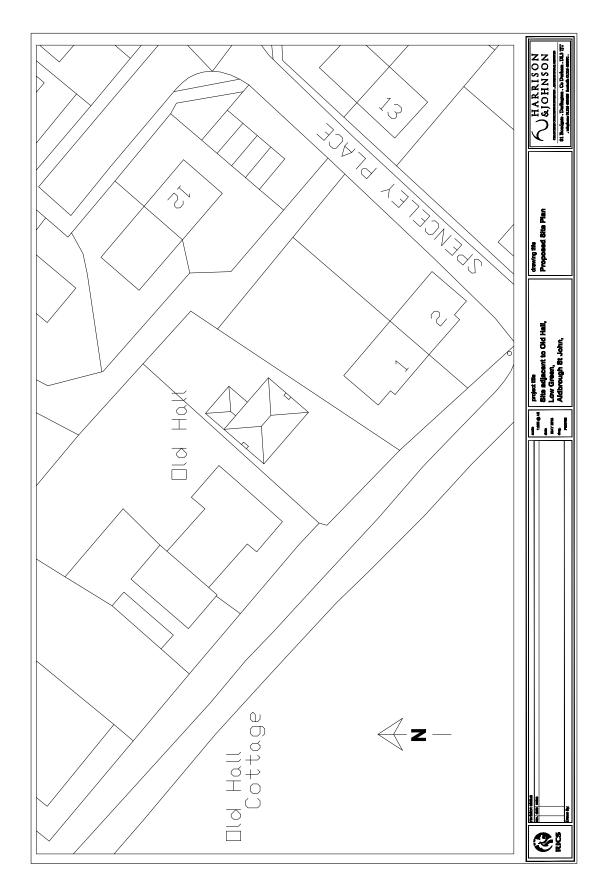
Proposed site plan (illustration prepared by Harrison and Johnson Architects)
